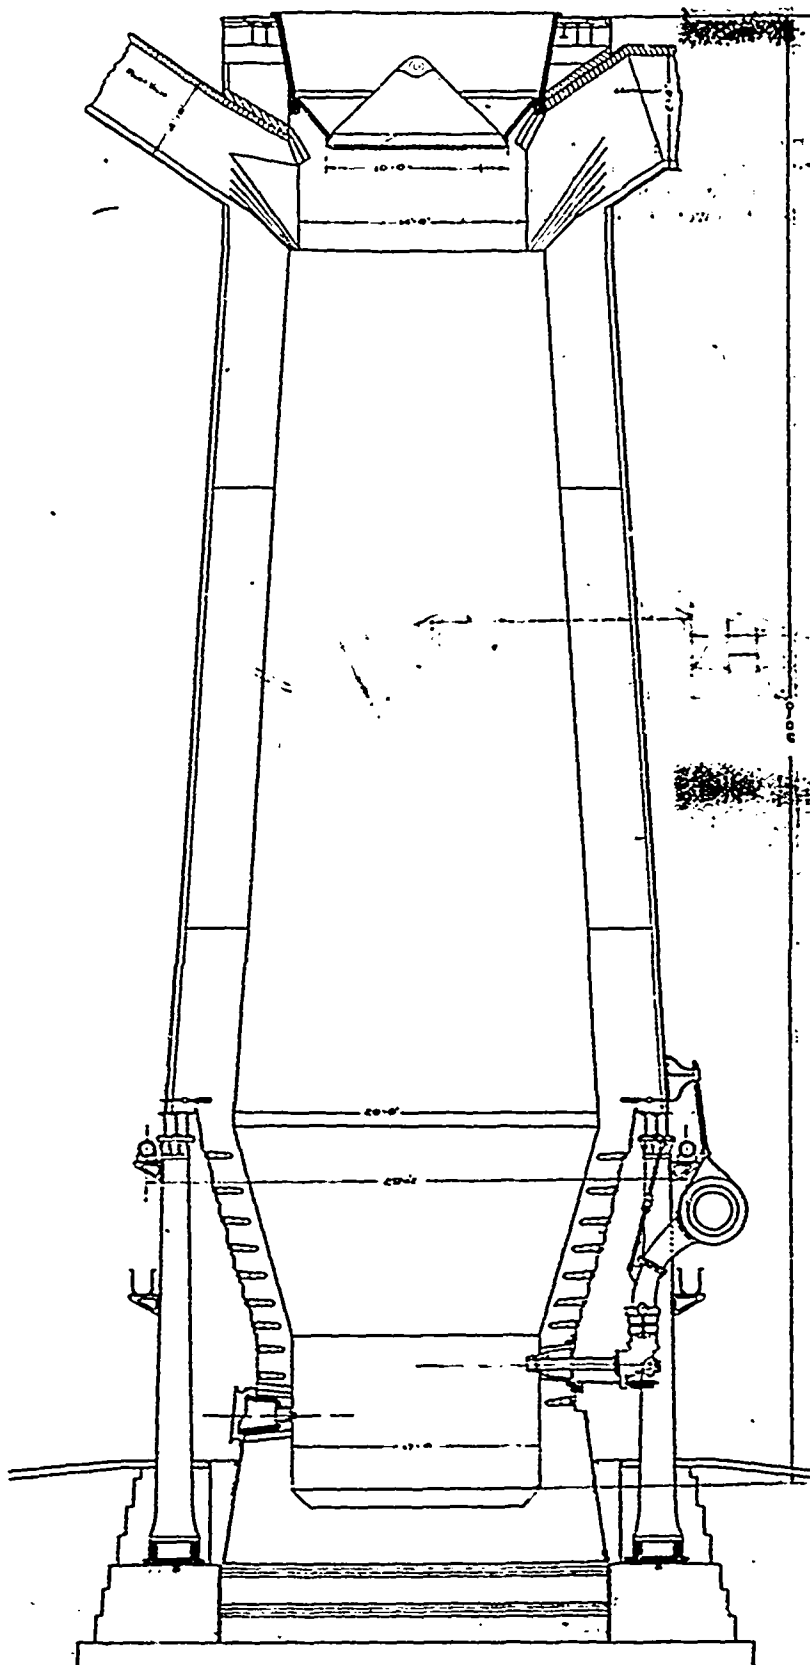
HAMILTON STEEL AND IRON CO.'S PLANT—ELEVATOR OF THE NEW FURNACE.
